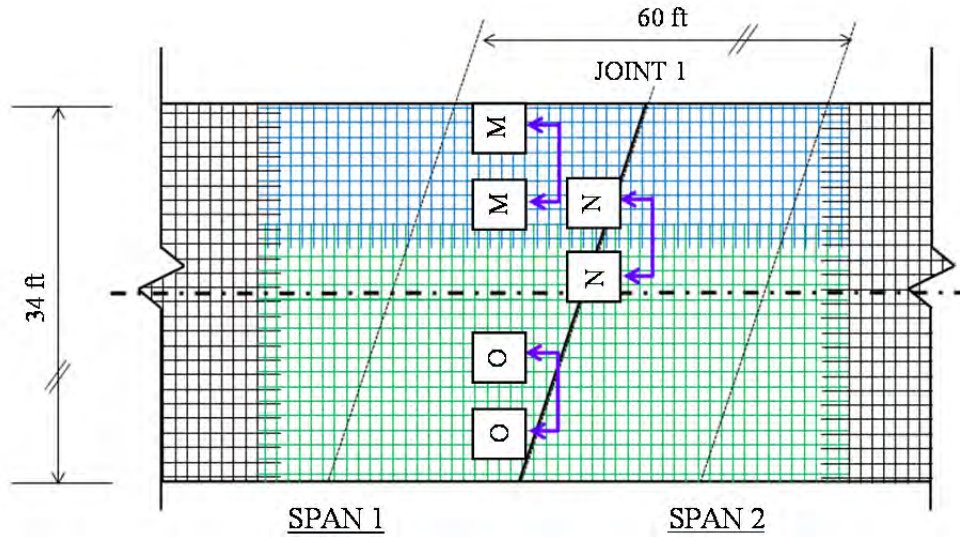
Details of transverse splices, Lampasas River Bridge (Span 1 and Span 2)
